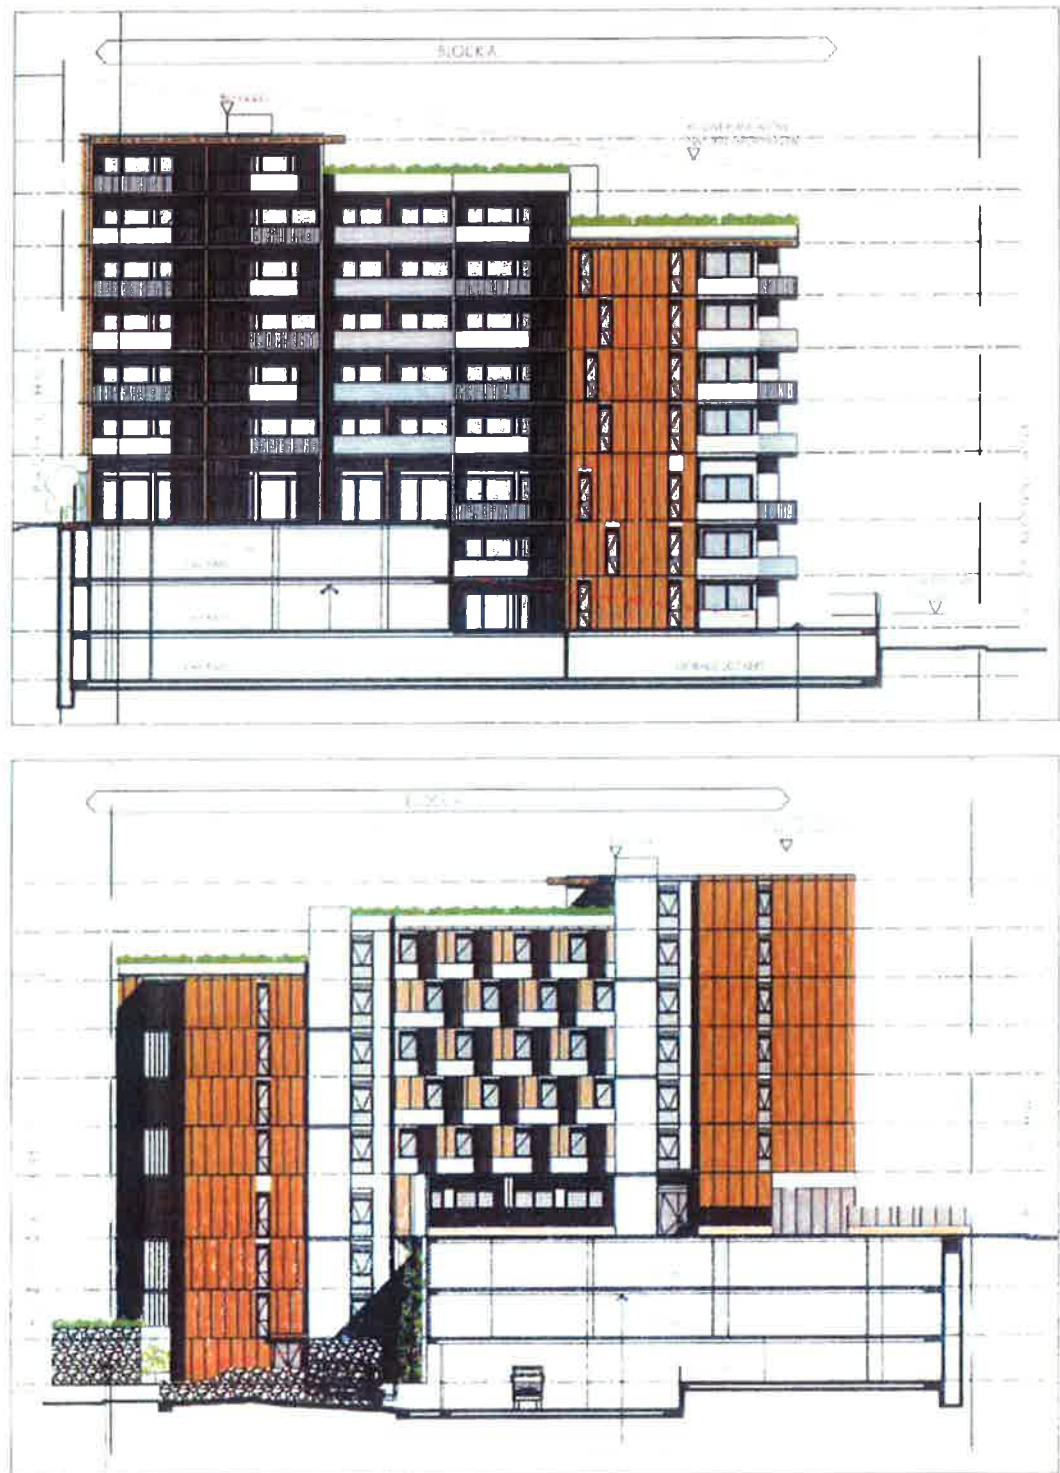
Cross sectional elevations of Building A from Pacific Highway to Fitzsimons Lane
